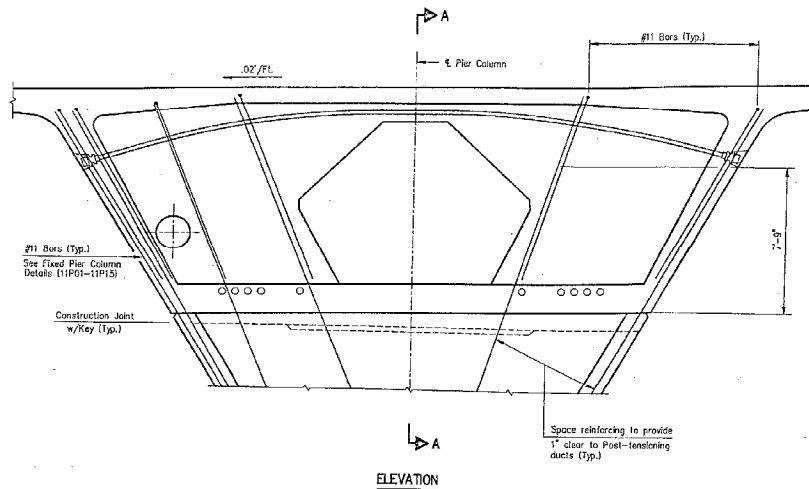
Cross-Section of Roosevelt Bridge Pier Segment
